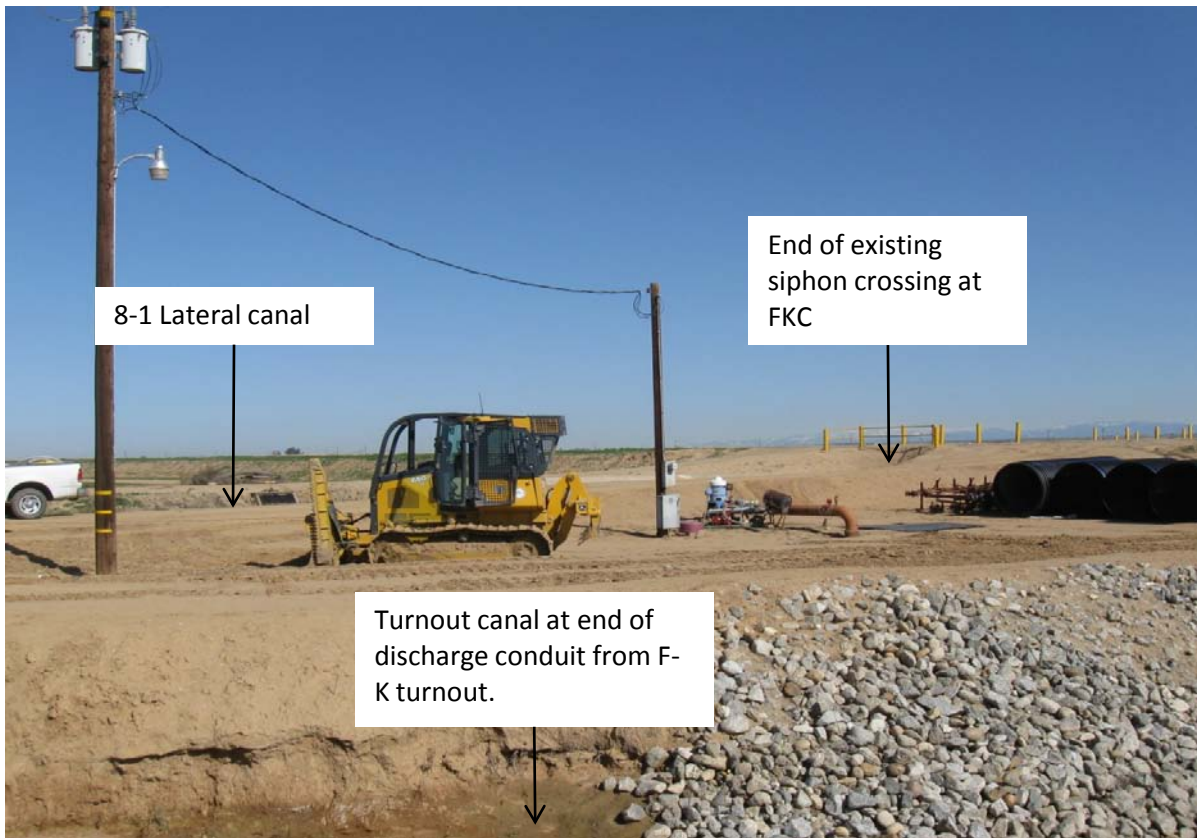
Looking north toward the 8-1 Lateral where the proposed pumping plant will be constructed.
